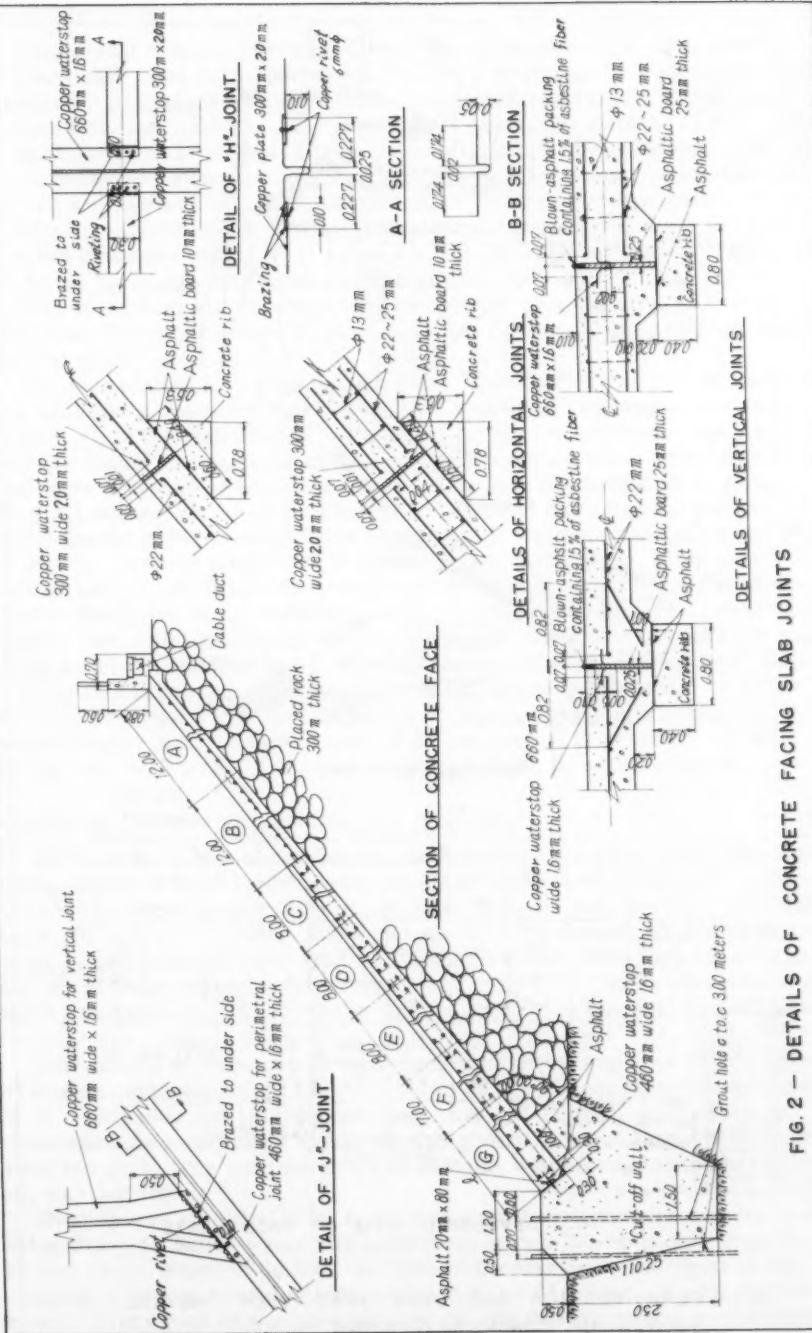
DETAILS OF CONCRETE FACING SLAB JOINTS
